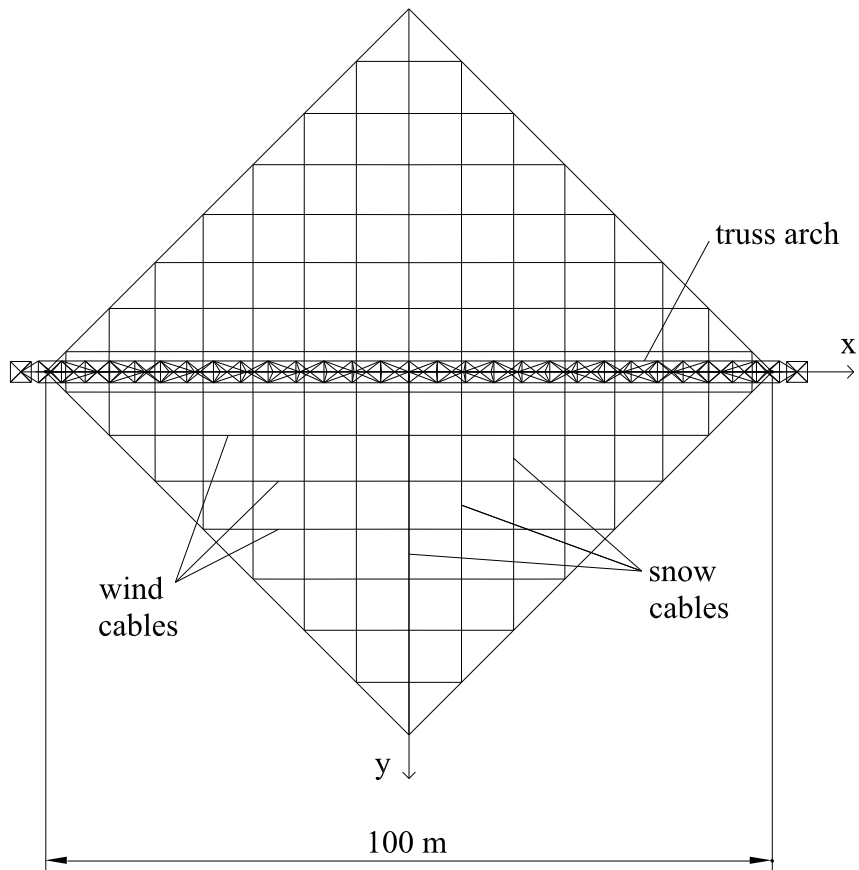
Floor plan of model 1, cable net supported by a single truss arch
